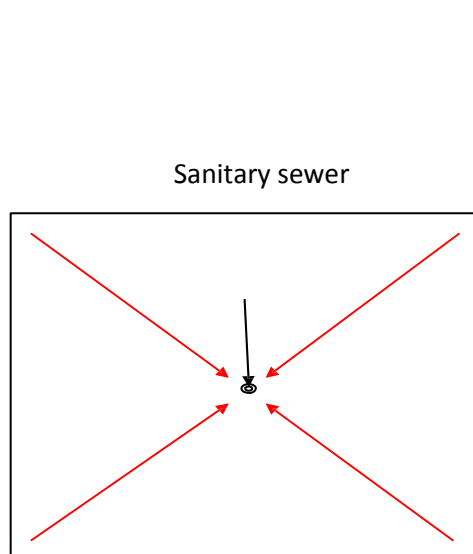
Pad interior drainage to sanitary sewer (plan view)
